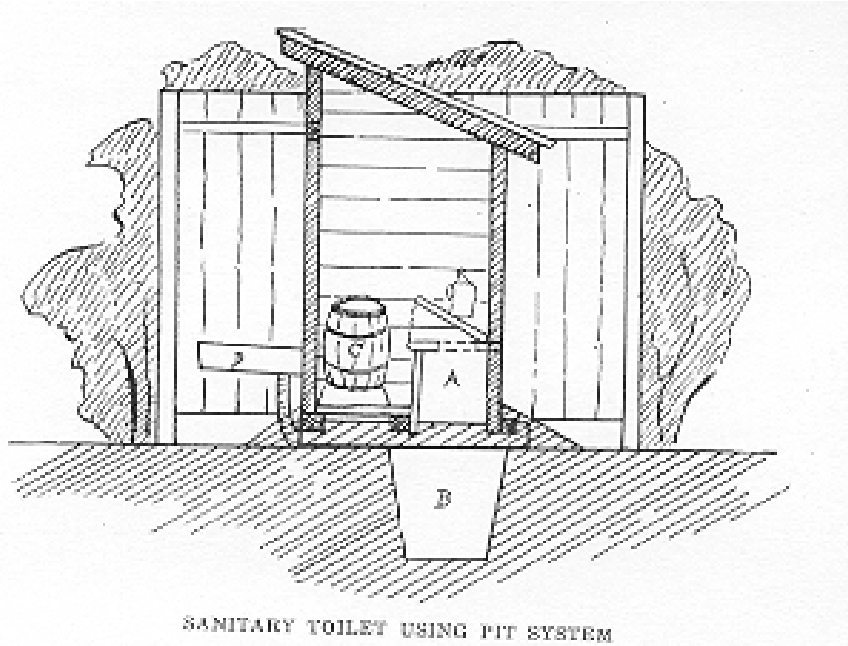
Rosenwald Community School Plan drawing for a standard privy.²⁰⁰
